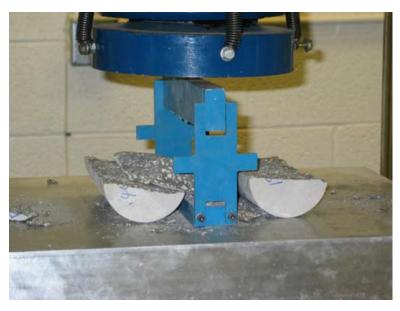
Specimen failing under Splitting Tension Test (Li, 2004)
